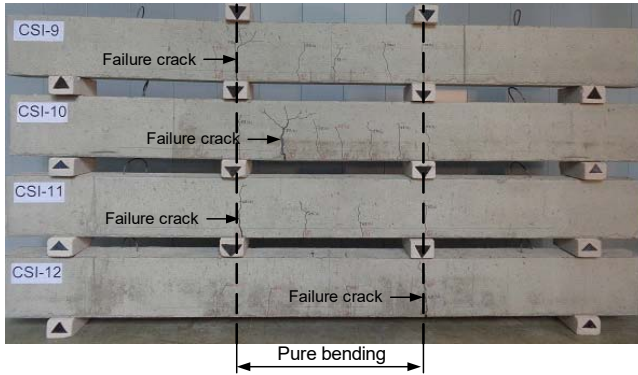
Failure crack position of pure bending zone for *Series III* beams
